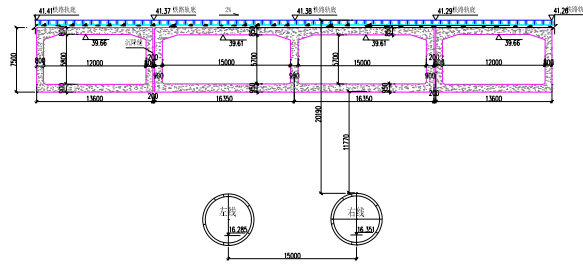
Relationship of shield tunnel and Railway box Calvert (unit: mm)
